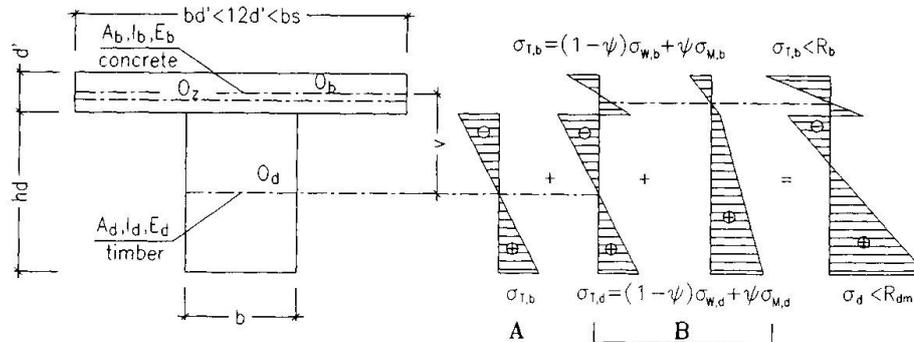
The distribution of stresses in concrete slab and timber joist:
